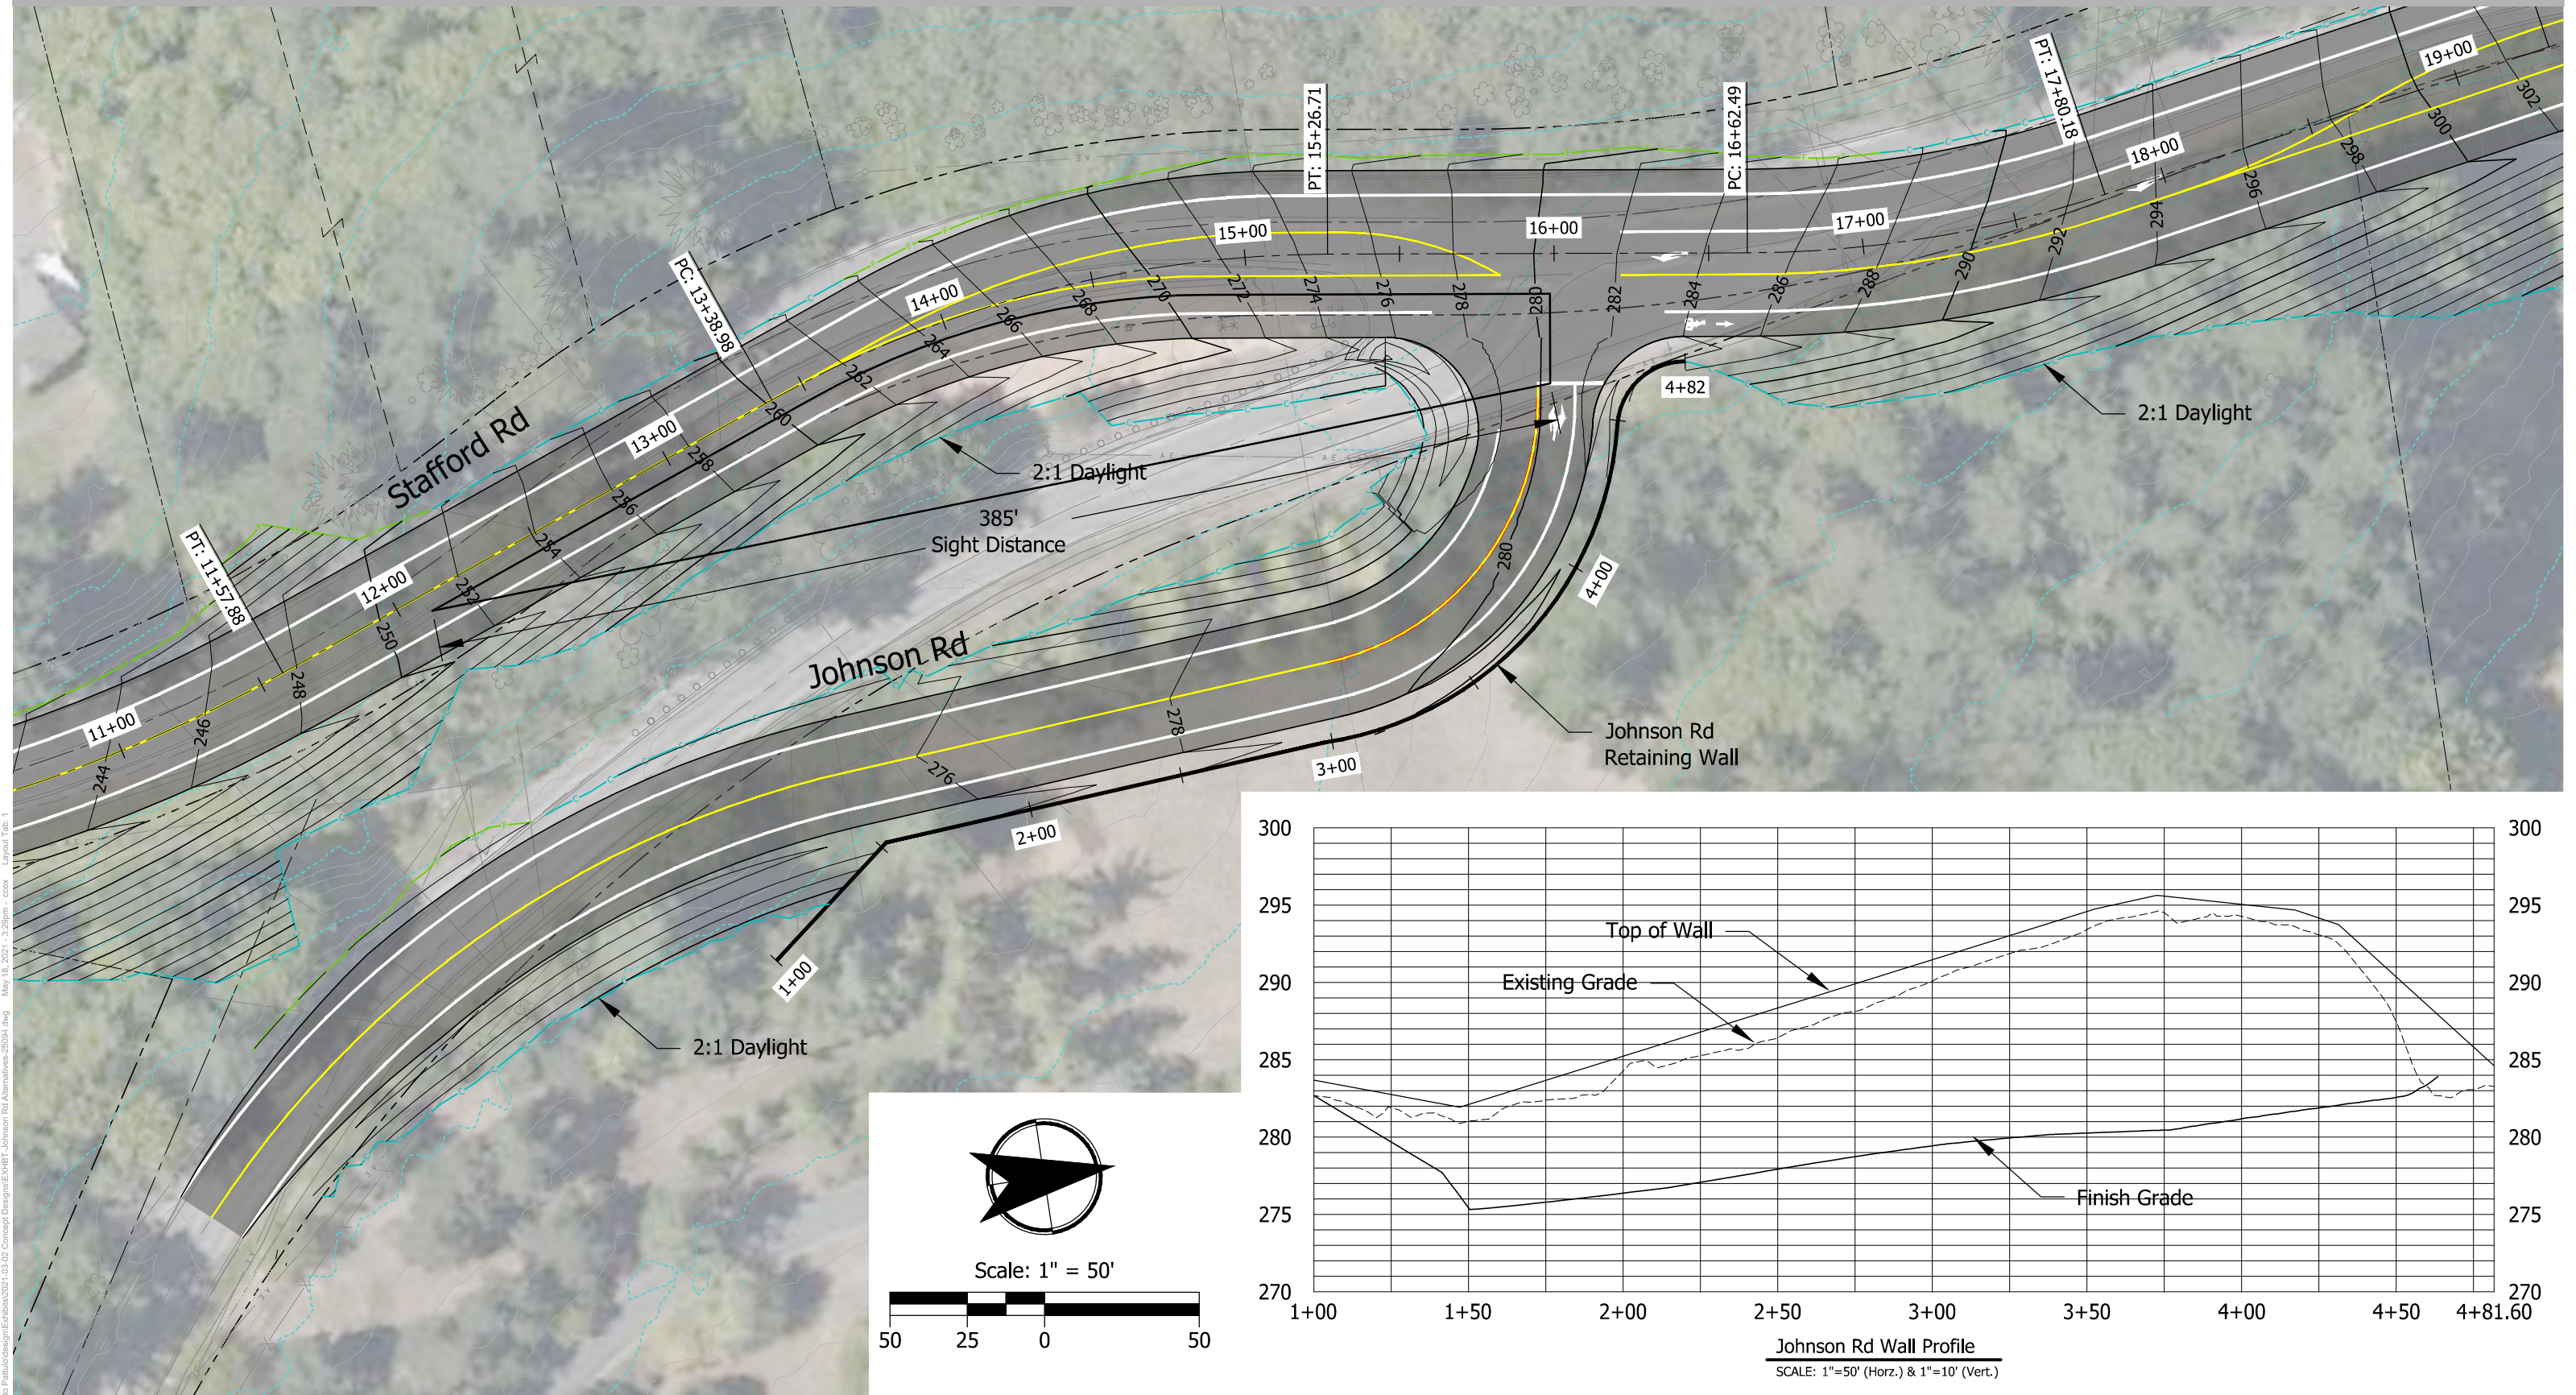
SW Stafford Road & Johnson Road Alternative 1- Expanded Side-Street Stop-Control Lane Configuration
